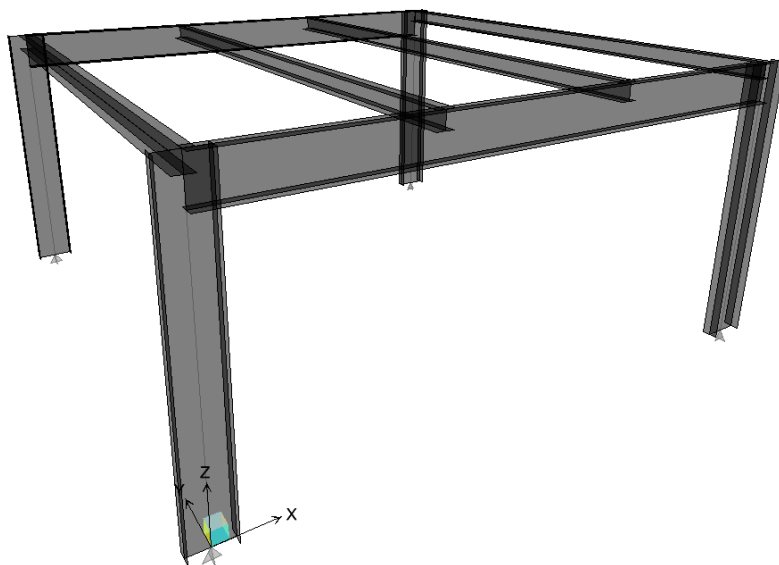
THIS IS AN ETABS MODEL OF THE TYPICAL BAY FRAMING.
